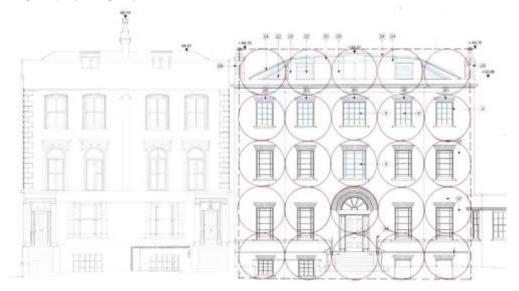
Attic storey elevation and chimney heights informed by the same proportioning system
